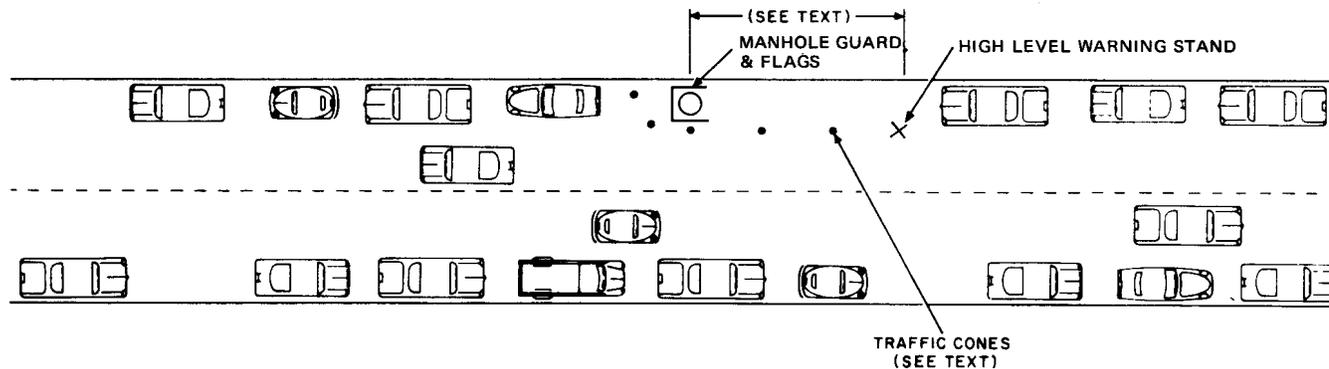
Placement of Warning Devices on City Street Without Truck - Underground Plant at Side of Street
